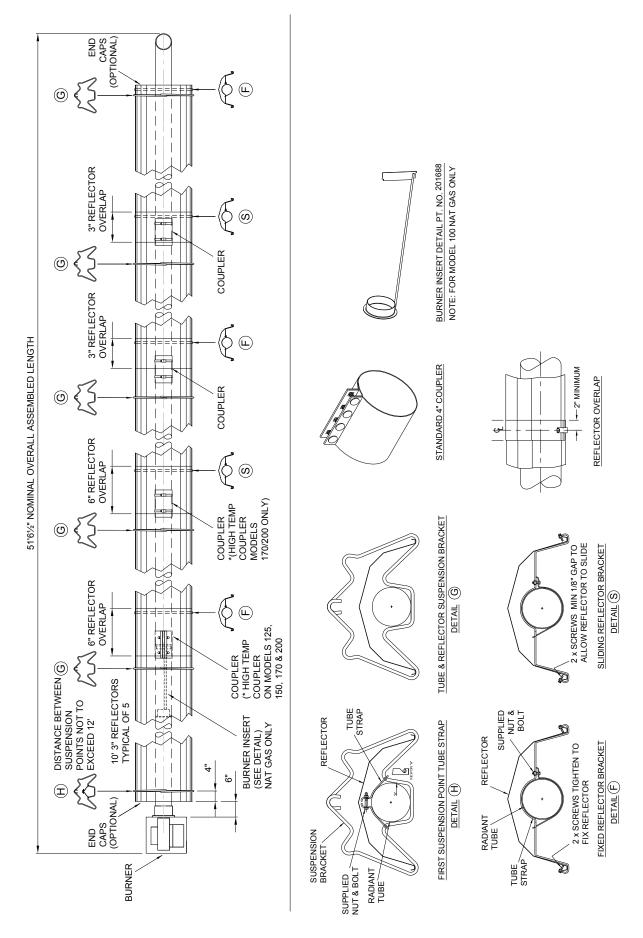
Heater Assembly: Model Linear 125-S60, 150-S60, 170-S60 and 200-S60
